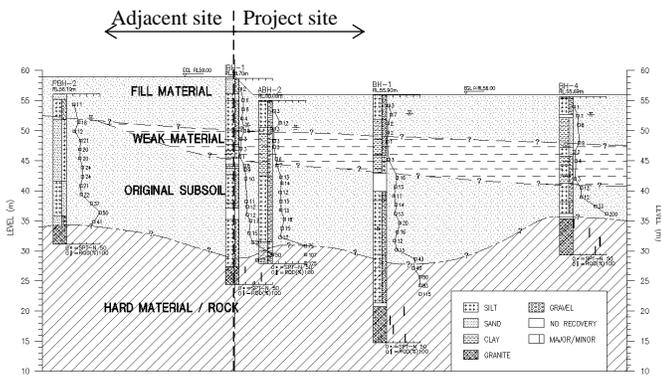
Typical cross-section of subsurface profiles at the distressed wall area.
